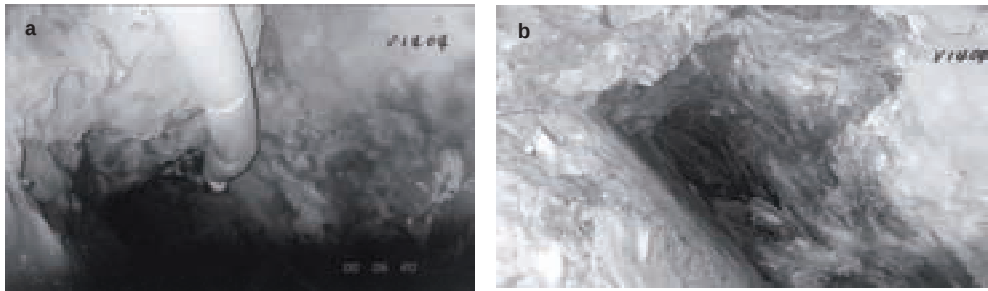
Roof collapse in a mine stope at a depth of 1000 m under the surface, (a) before the collapse, (b) after the collapse. A portion of roof rock up to 3 m thick fell down.
